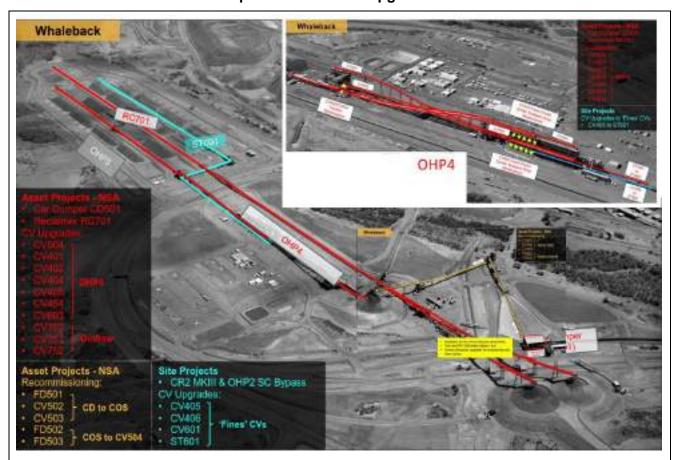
Ore Handling Plant 4 and Car Dumper Upgrades
